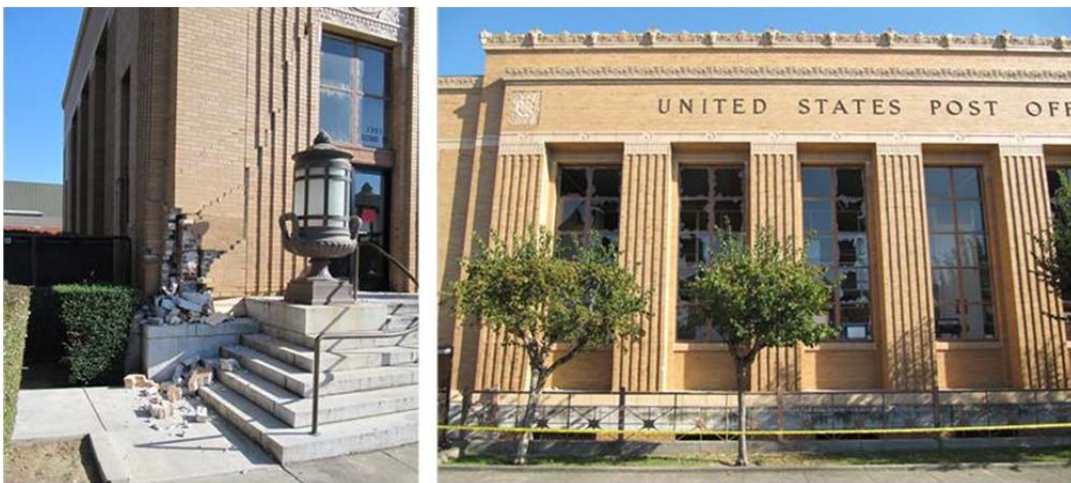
Damage in the north lower corner of Napa Post Office Building (Building E in the map in Figure 6) and smashed façade and glass windows.
